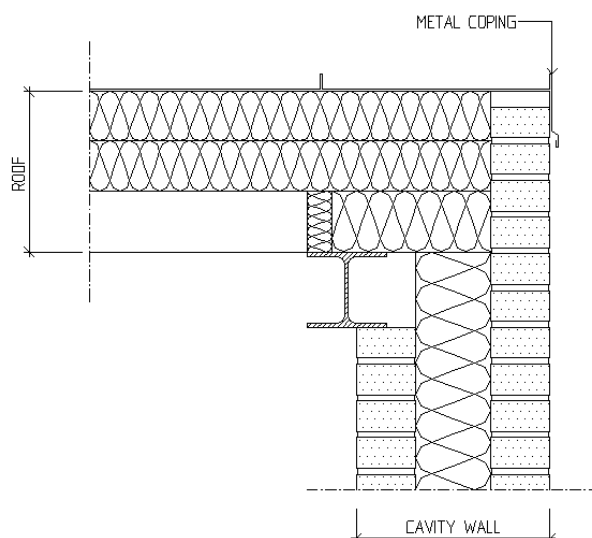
Vertical section through the external cavity walls, Municipal Bath, Lund, Sweden.
